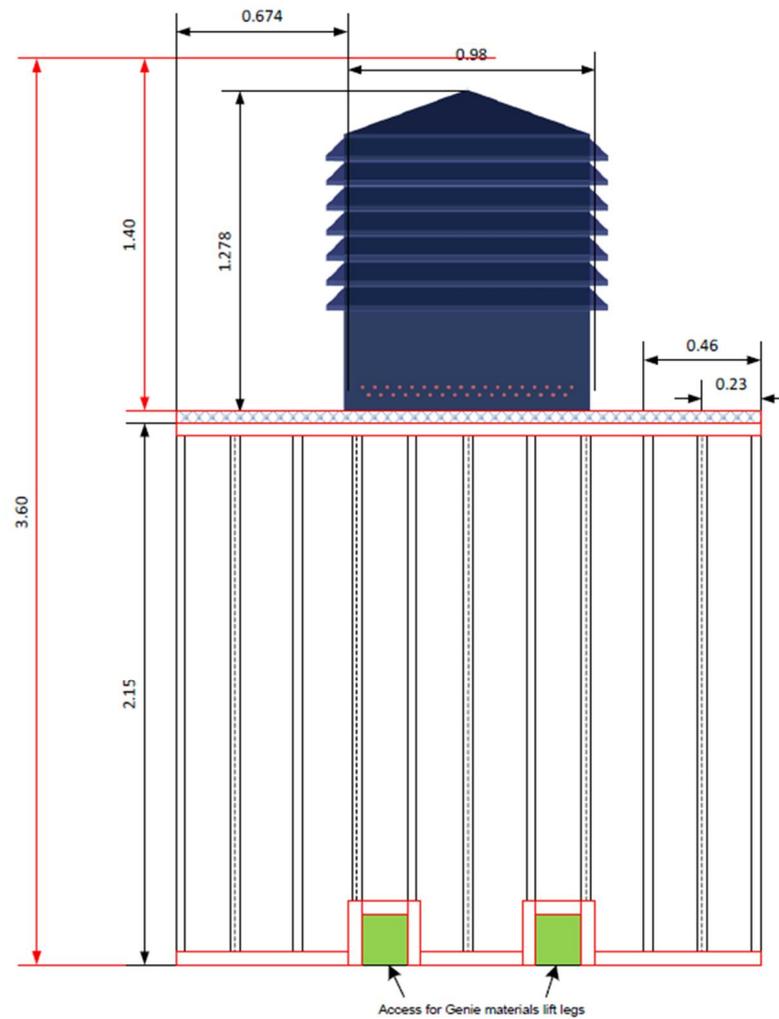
Test room – Elevation. Details of test room and location of wind catcher tower on roof.
